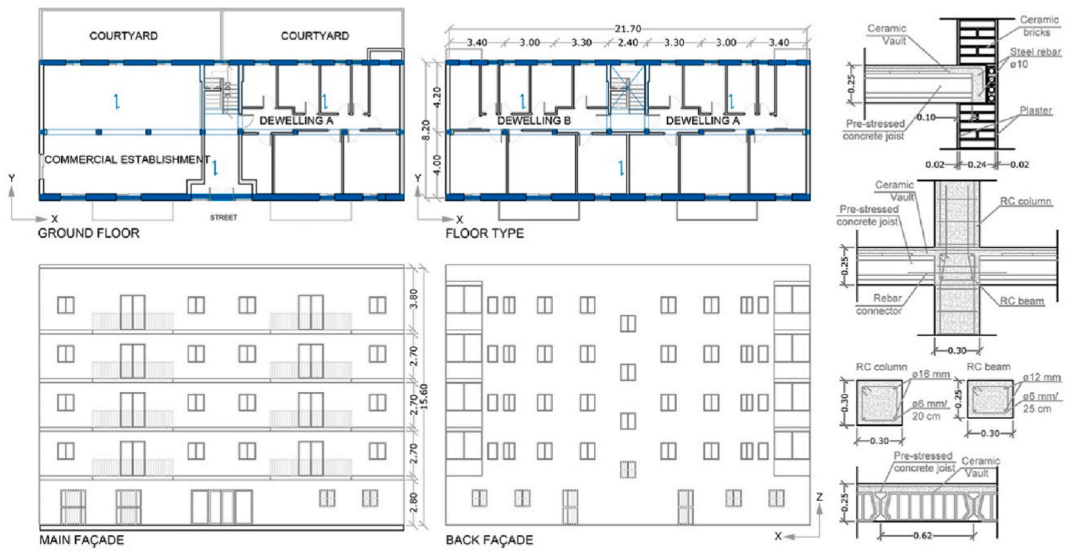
Structural configuration. Distribution in plan and elevation. Constructive and structural details.
